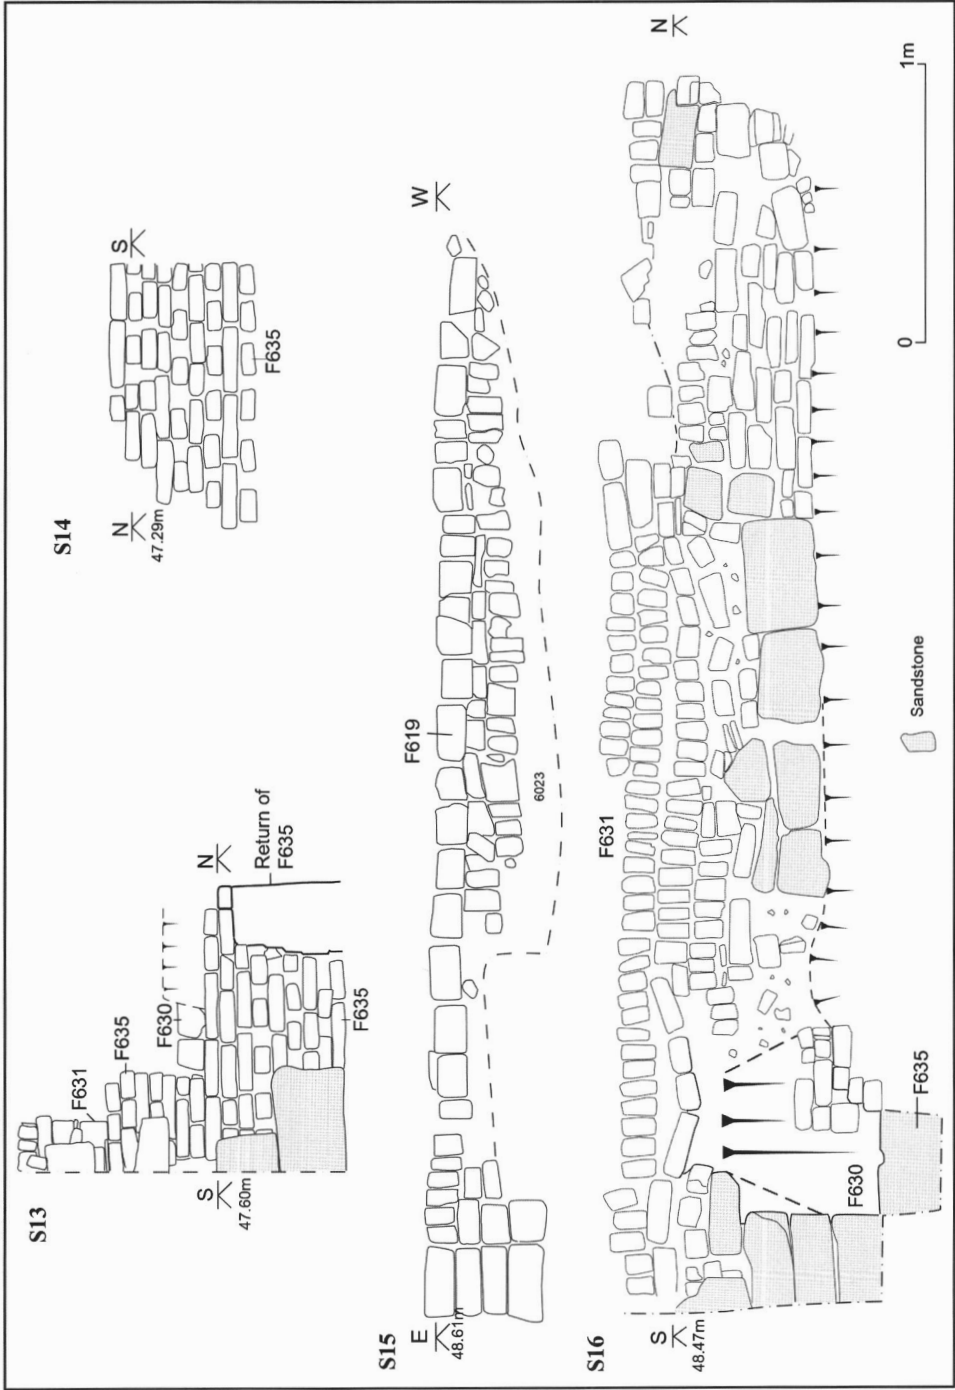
Derby, King Street: Phase 3 building elevations (Scale 1:40).
